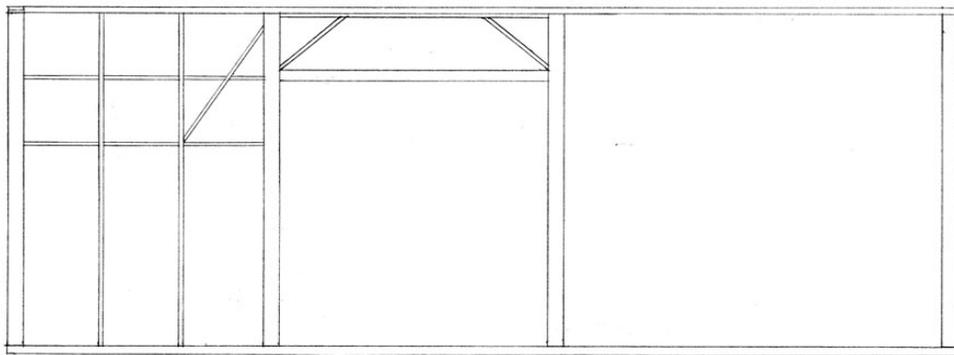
New Barn, north elevation framing depicting timber posts, 2 by 6 studs, and 4 by 8 plate and sill, as well as framing of central bay, based on visible elements (not to scale, 2005).
